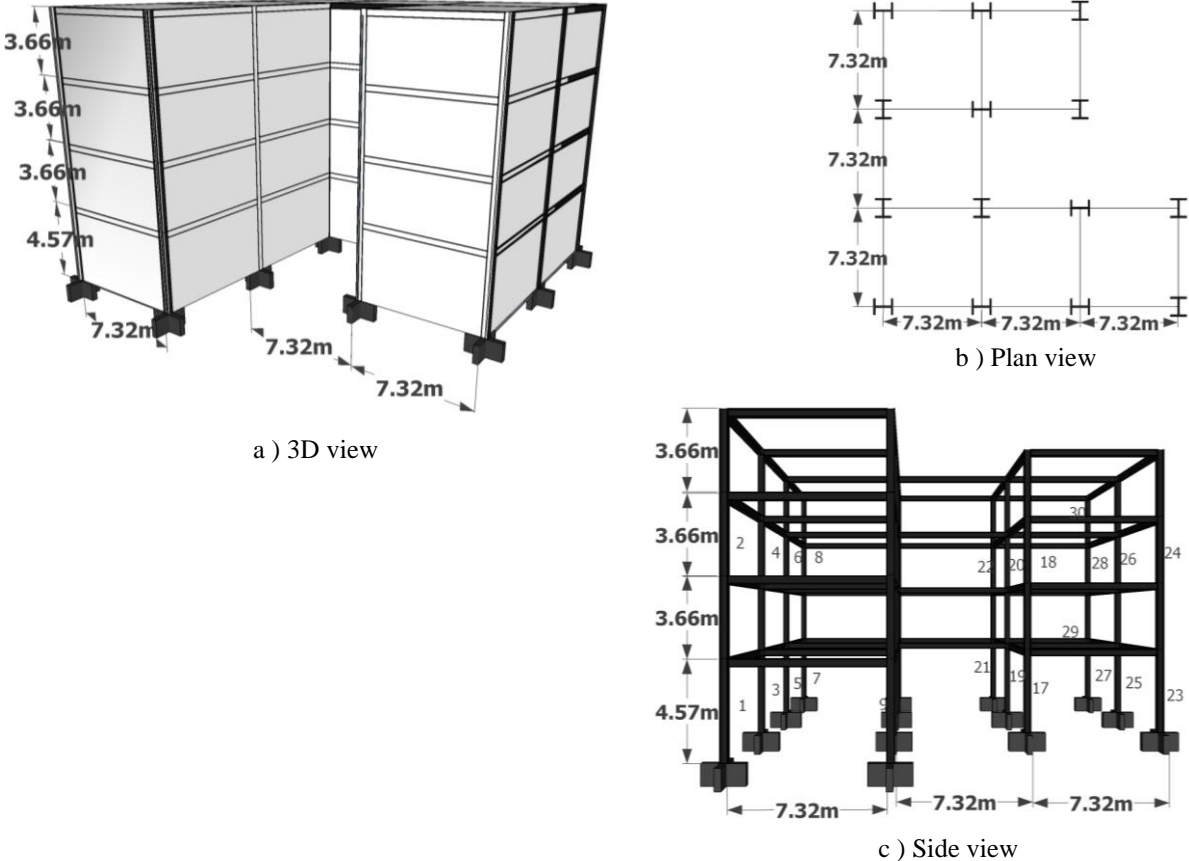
3D, plan and side views of four-story, 132-members space steel frame.
